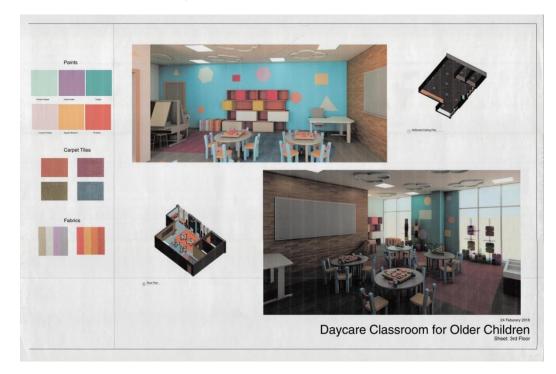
Example of Two Dimensional Drawing, Drawing Scan, March 2016. (Student Work – Unidentified)
